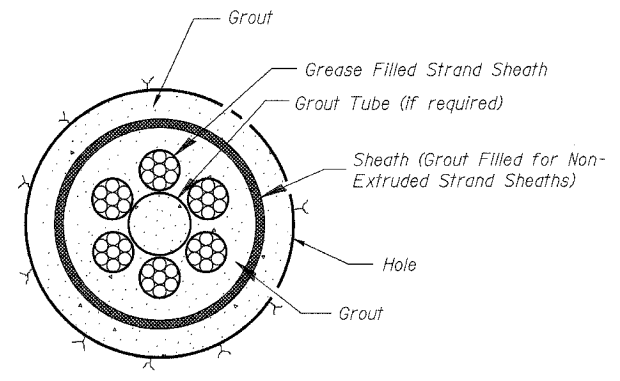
DETAIL OF CORROSION PROTECTION & TENDON DETAILS
